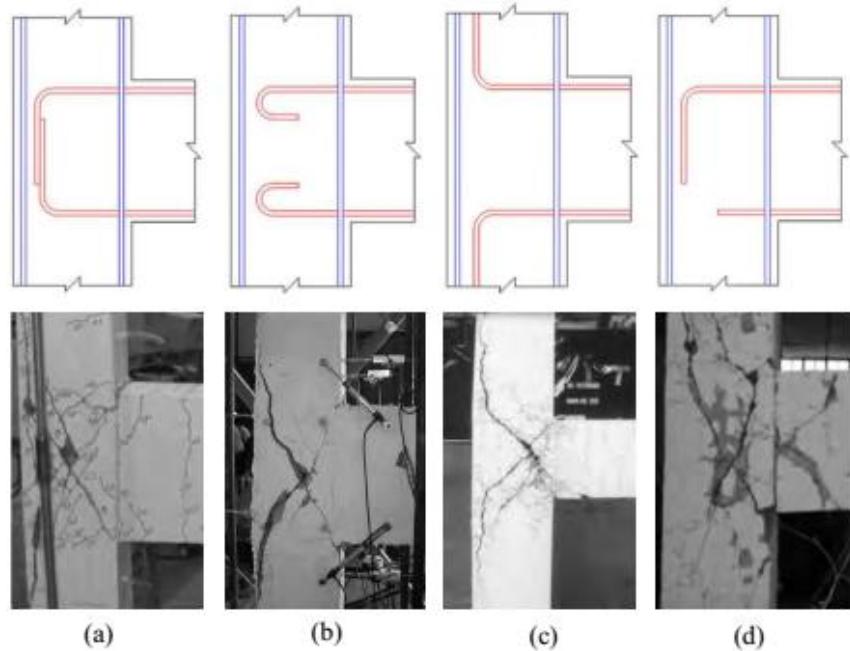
Failure mode of common end anchorage of beam longitudinal bars in joint core (a) beam bar bend in the joint core [62],(b) end-hook bend by 180° [5],(c) beam bar bend away from joint core [18] and, (d)short bar terminated in the joint core [29].
